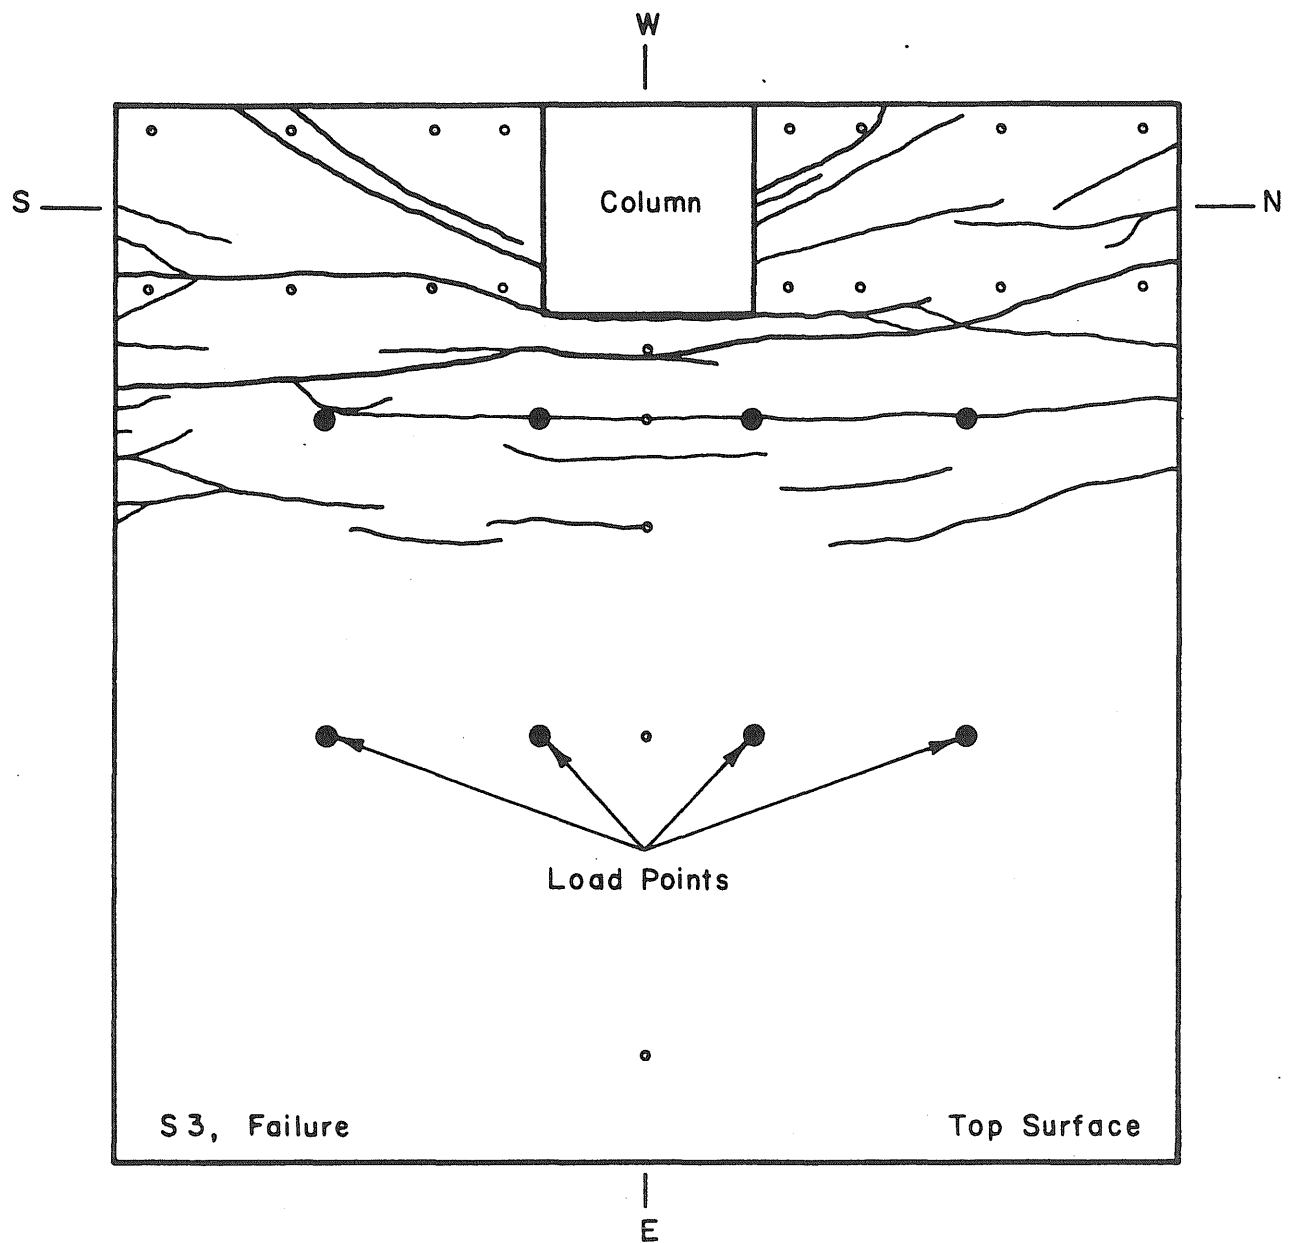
Crack Pattern at Failure on the Top Surface of Specimen S3
